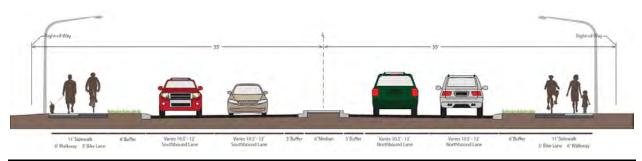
Proposed Typical Section –NE McWilliams Road to NE Fairgrounds Road
